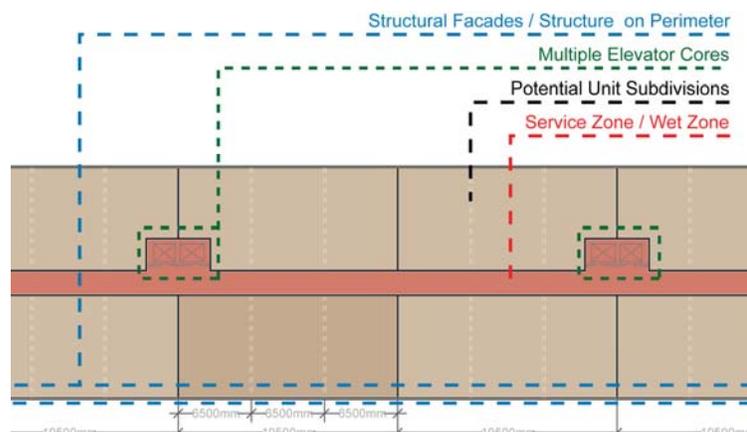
Diagrammatic Floor Plate with Multiple Elevator
